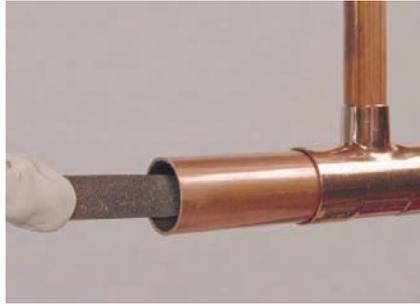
A round file or other devices can be used to ream the tube ends.
